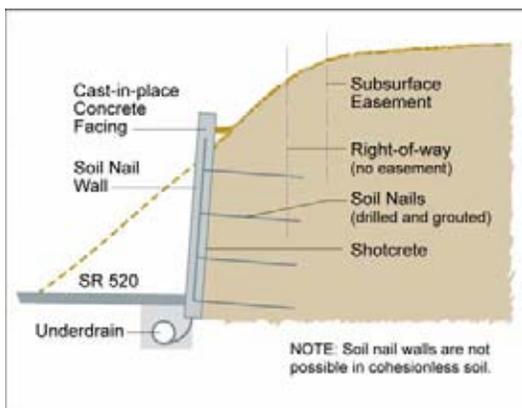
Typical Soil Nail Wall in a Cut Slope
